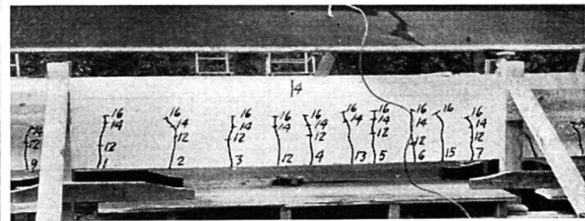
Crack Distribution in the Grouted R-Beam (RI).
